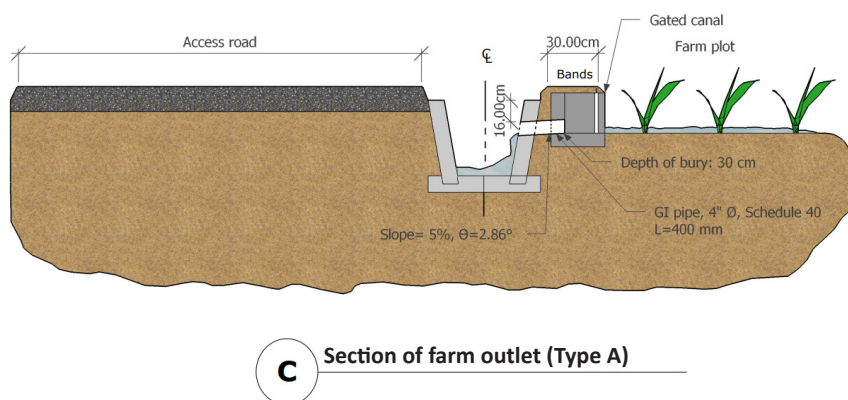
Cross section of the main concrete ditch showing the pipe drain at REMD farm.
